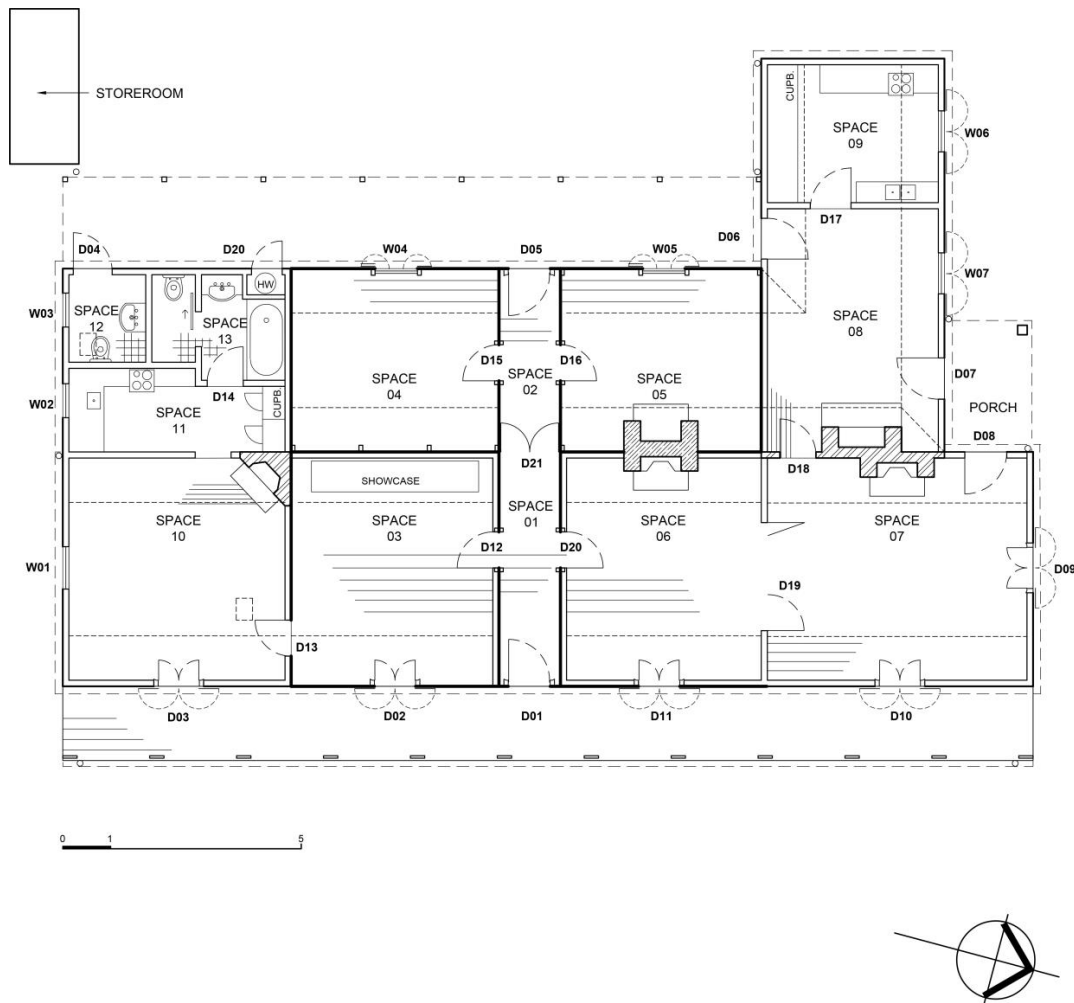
29: Don Bank Floor Plan as existing, LSJ, 2022
